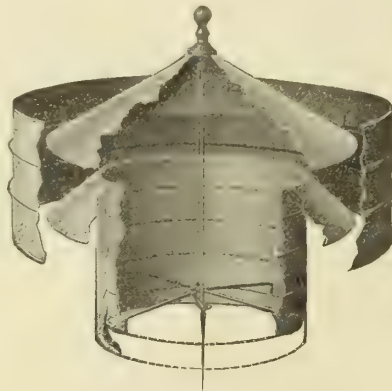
SECTIONAL VIEW OF "BURT" SLIDING-SLEEVE METAL-TOP VENTILATOR
